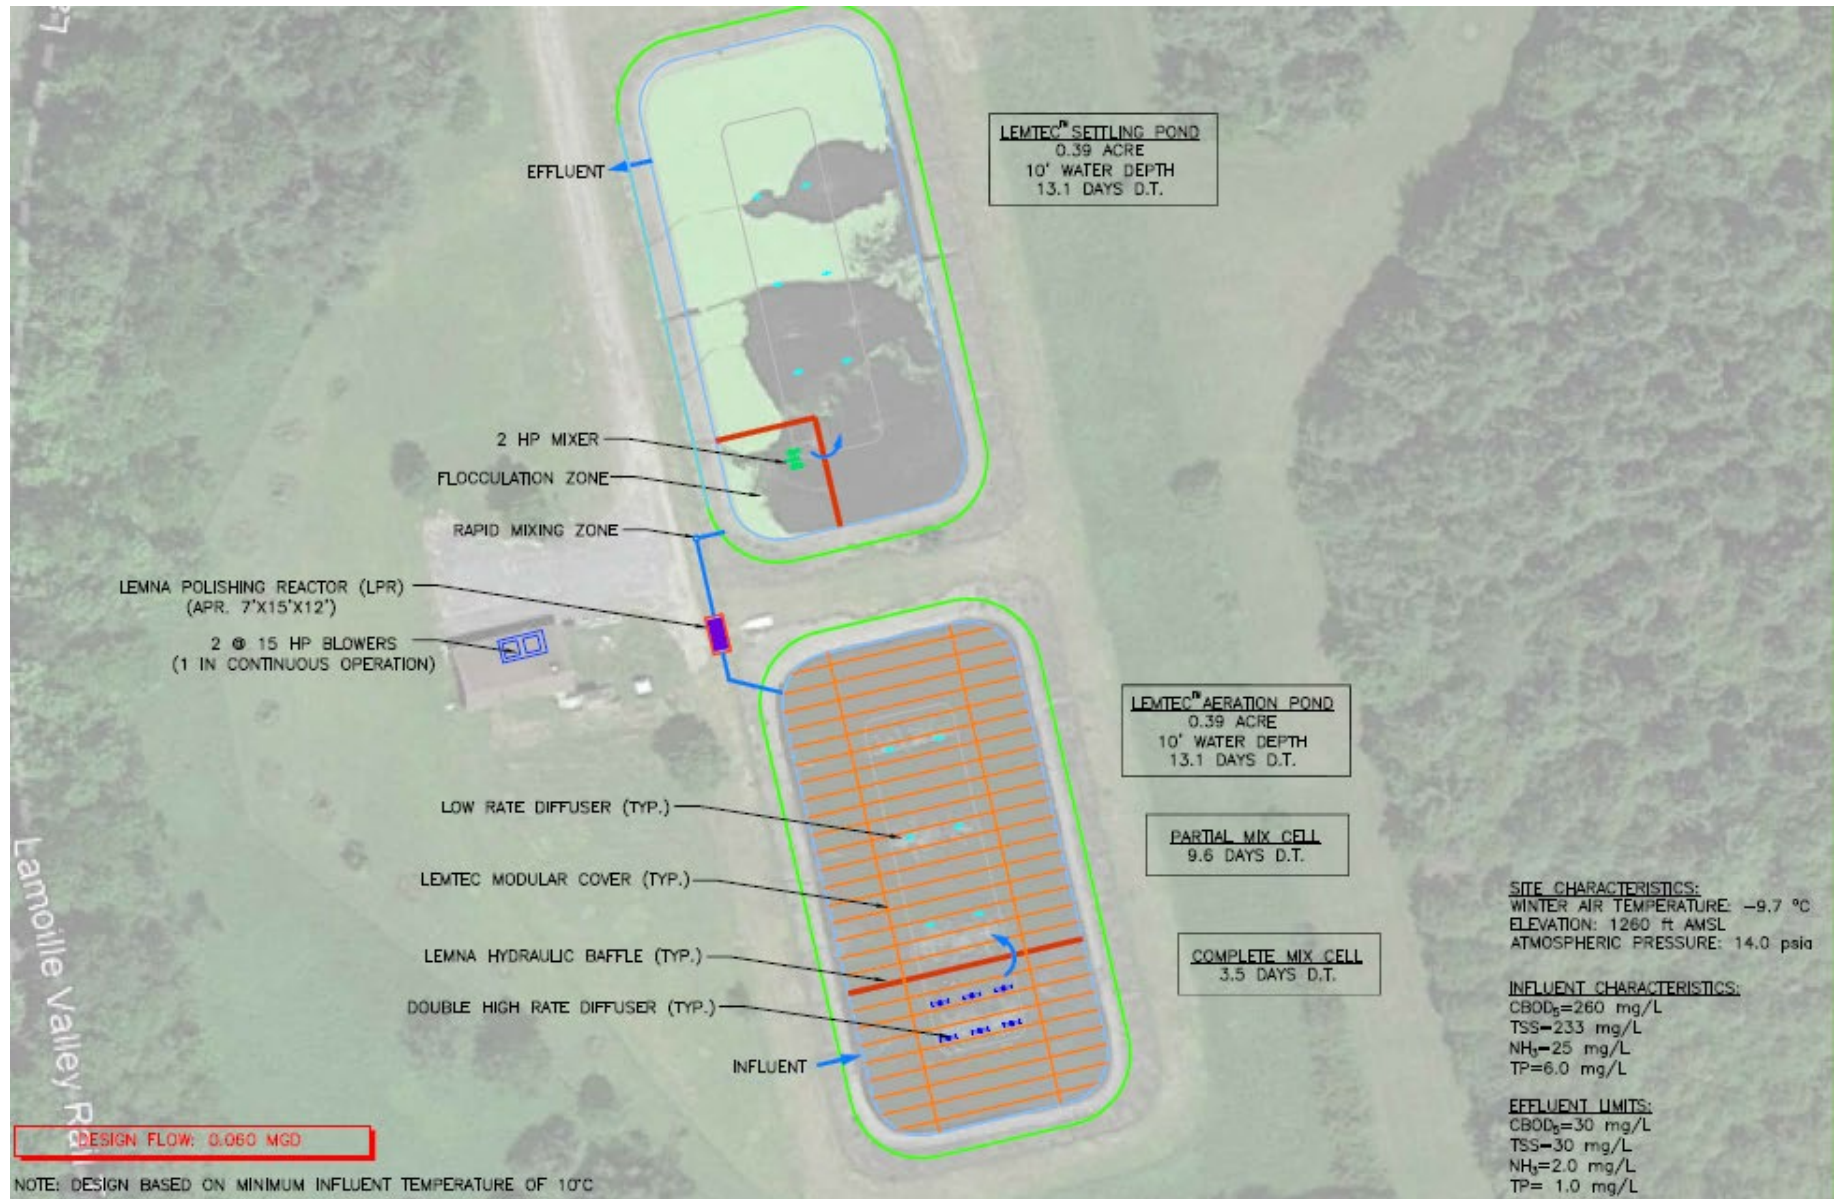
Alternative 4 – Covered Lagoon Layout
